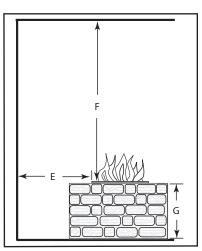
Clearance to Combustibles (Not to be used in an enclosed space)
